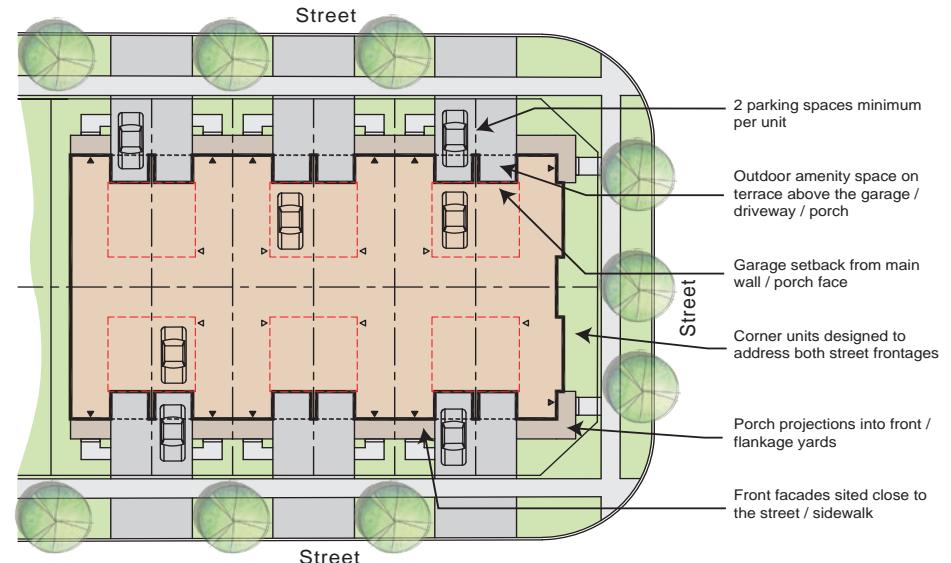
Conceptual plan layout for back-to-back townhouses
